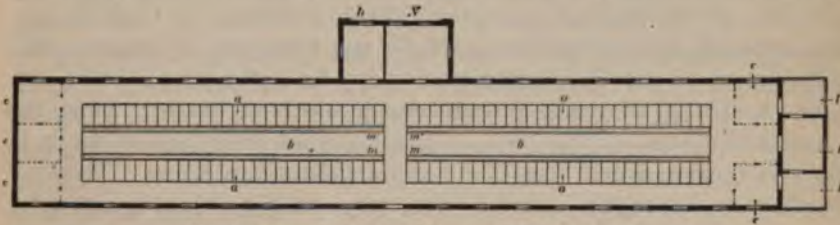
Ground plan of cattle barn at Valdemar castle.
